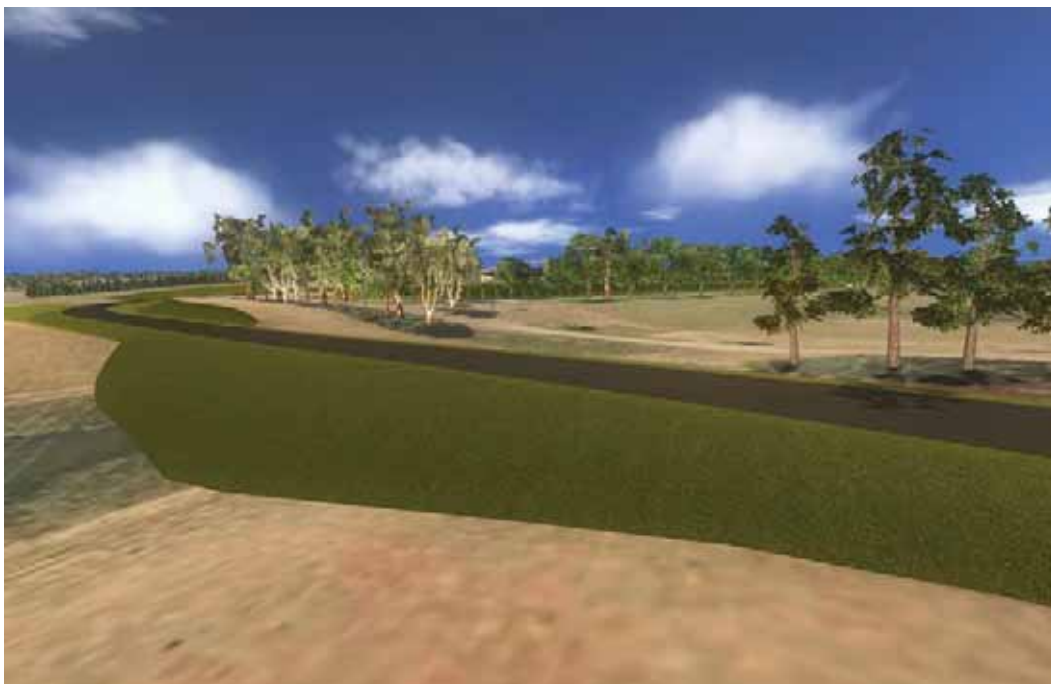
3D model screen grab of the elevated view of the proposed road (dark alignment) adjacent to the existing and historic driveway.
